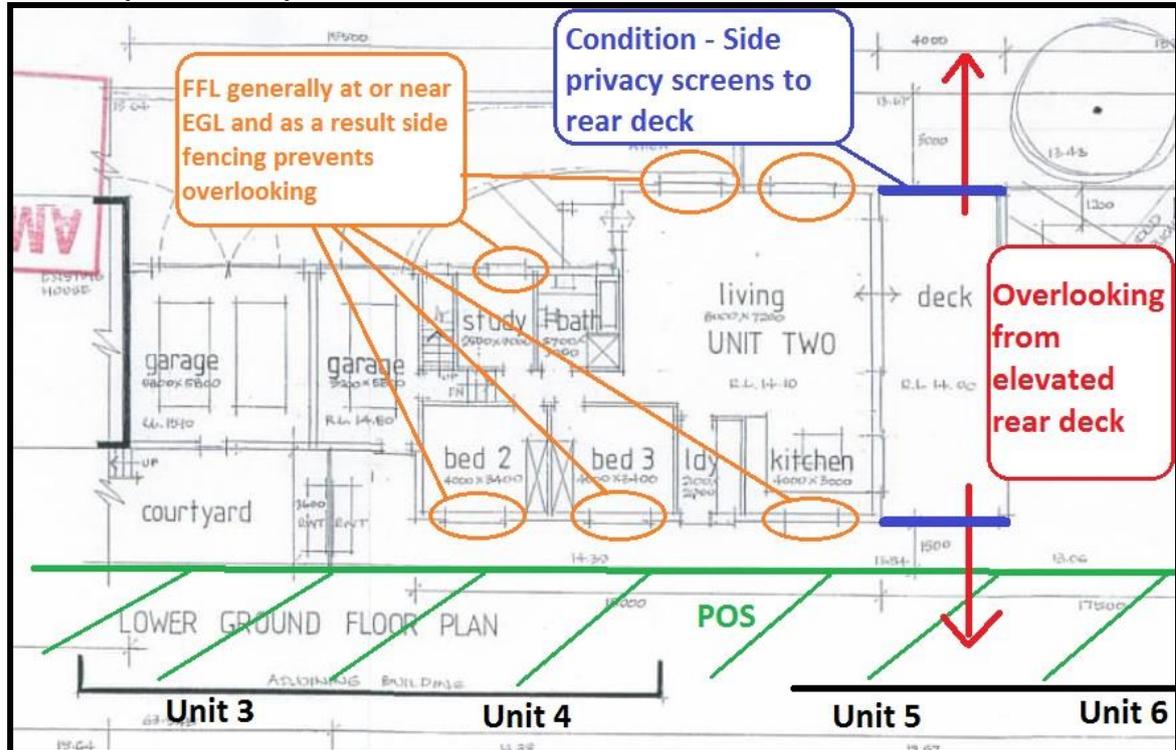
Lower ground floor plan diagram indicating that side fencing prevents overlooking from the windows circled in orange (note – subject to condition regarding the kitchen window). Shown with red arrows is the potential for overlooking from the elevated rear deck to the properties to the north and south. It is recommended that a condition be imposed requiring privacy screens to the sides of the deck (position marked in blue) to prevent this potential overlooking.
